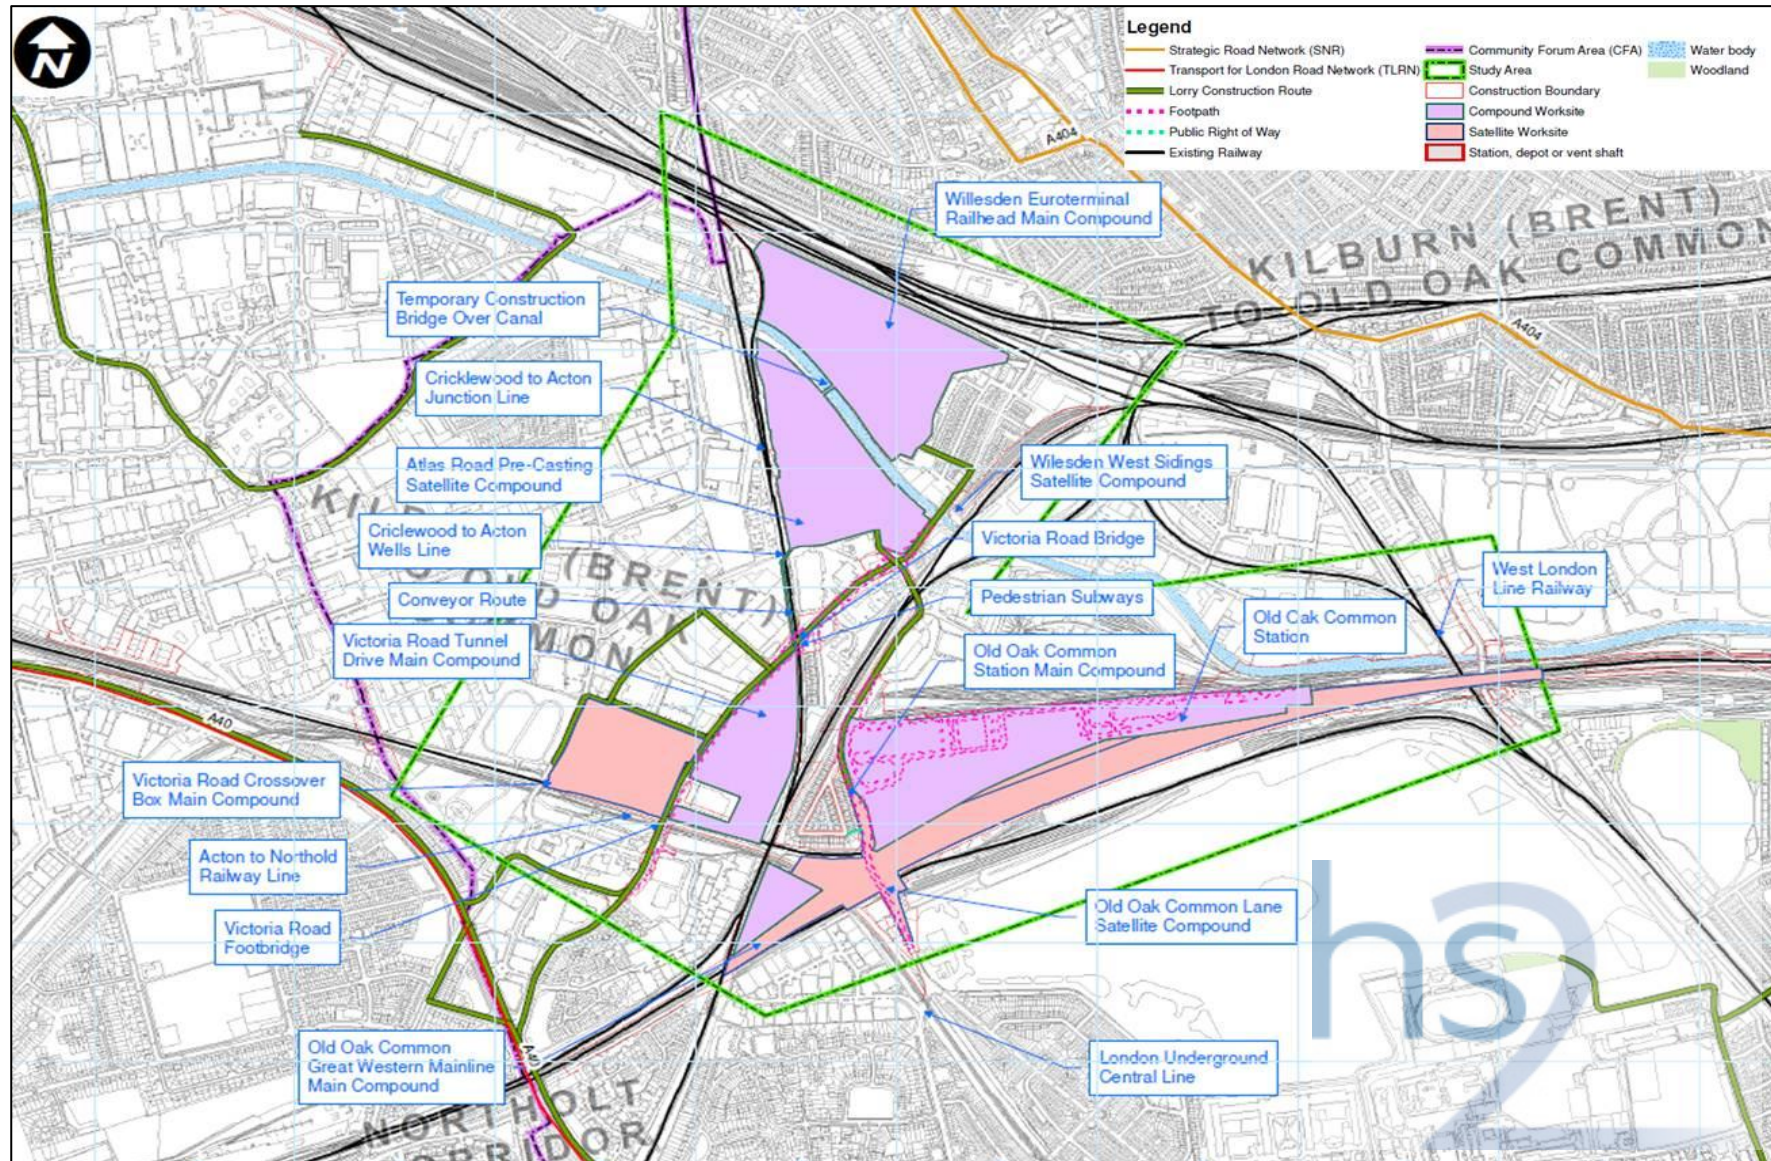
CFA5 Wider area core road network, compounds & construction routes (CFA5 Centre)
